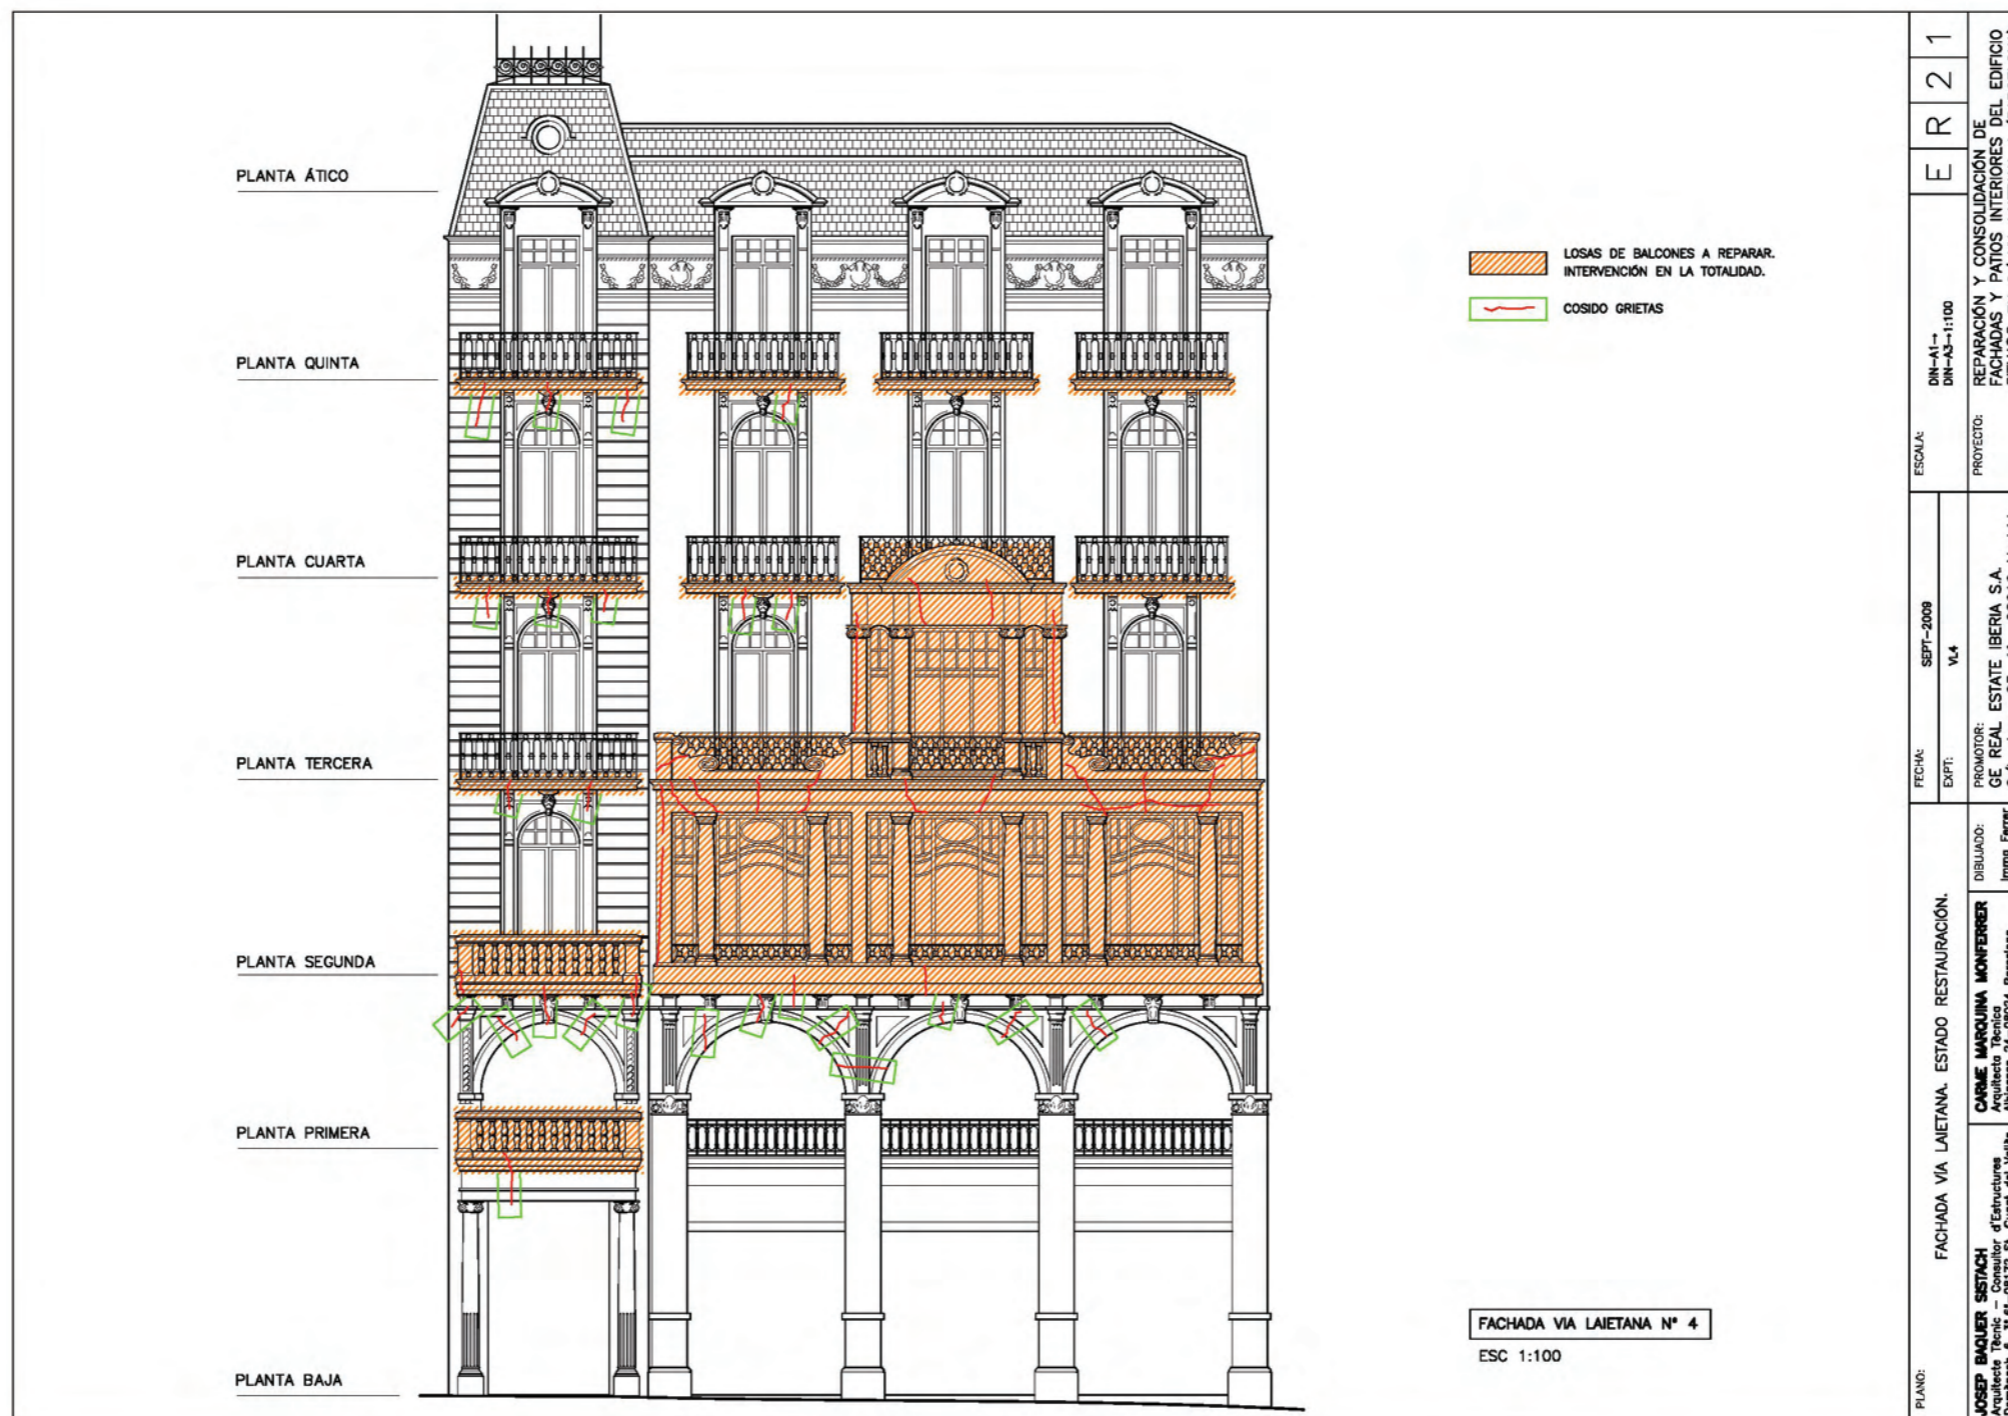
Via Laietana's façade: map of lesions/damages.
